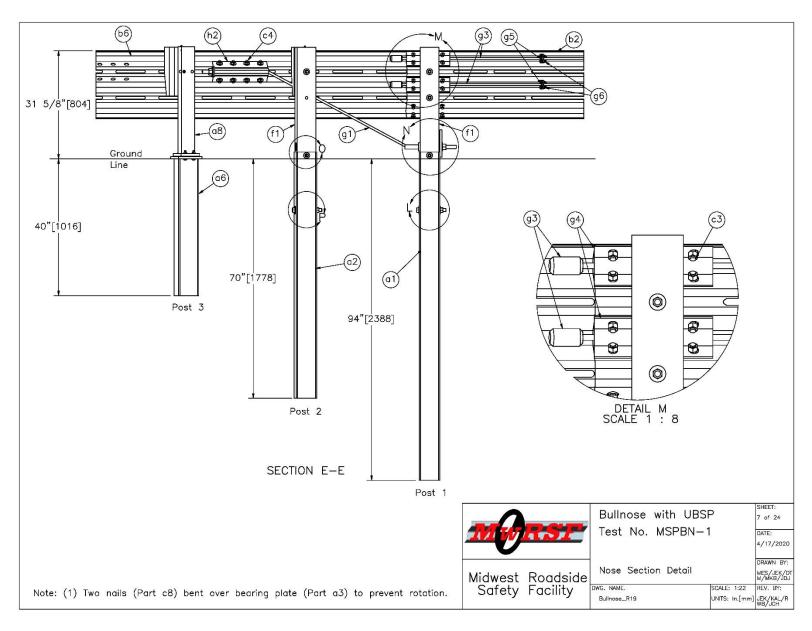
Nose Section Detail, Test Nos. MSPBN-1 through MSPBN-3
